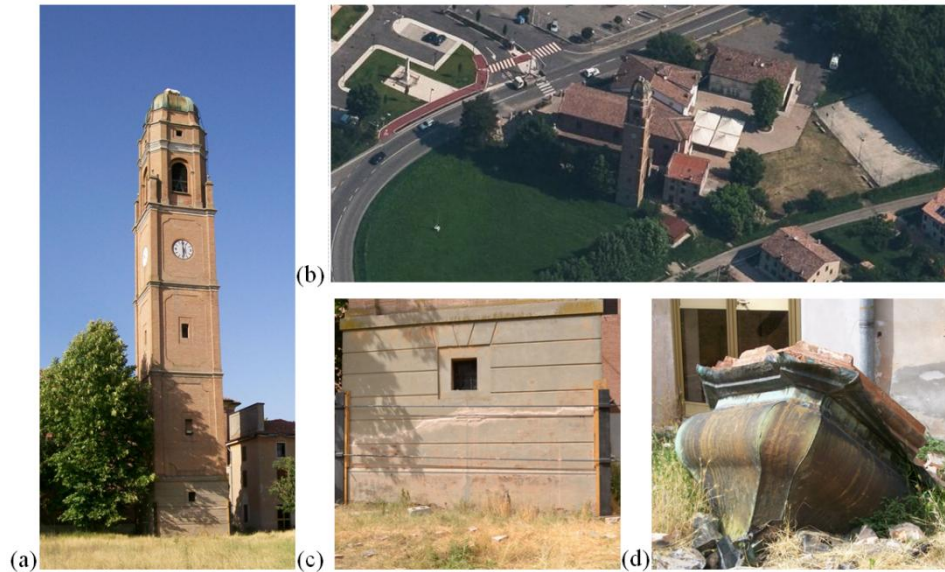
Some images of the damaged bell tower: (a) southwest side of the building; (b) panoramic view; (c) cracks at the base of the tower; (d) collapsed top.
